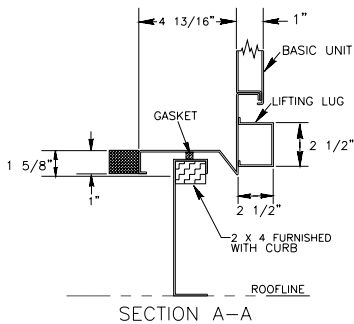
90-130 Ton Roof Curb Dimensions
